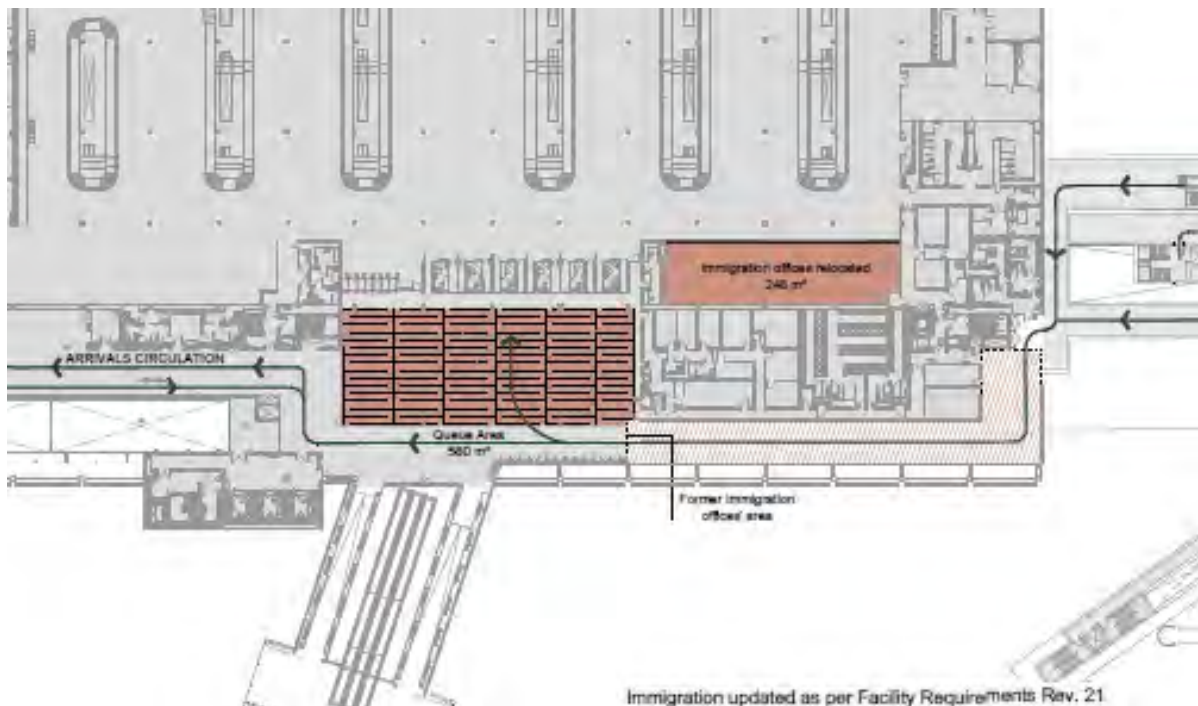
Proposed layout for immigration facilities at Terminal 2.
